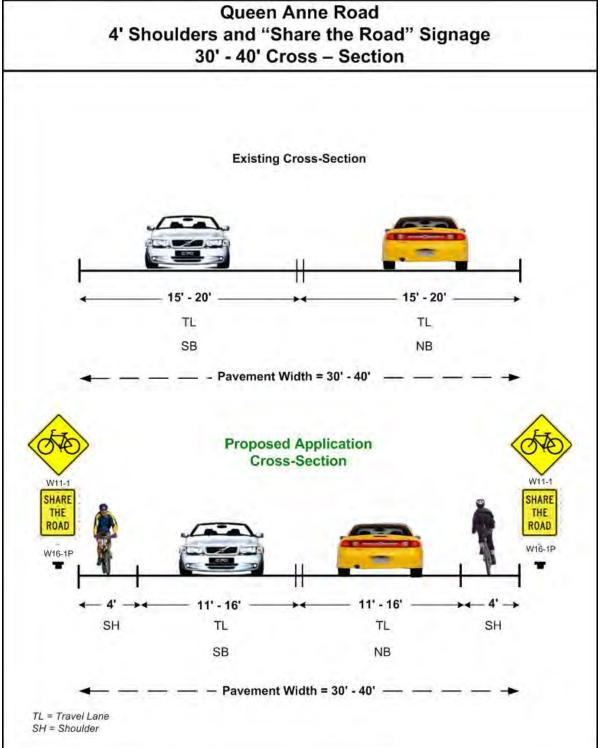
Queen Anne Road Cross Section with Shoulder Application
